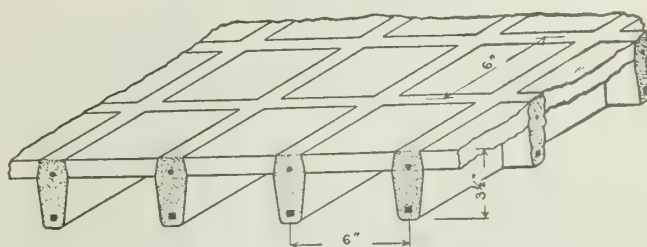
DETAIL OF "BRUNER" FLOOR LIGHT CONSTRUCTION
